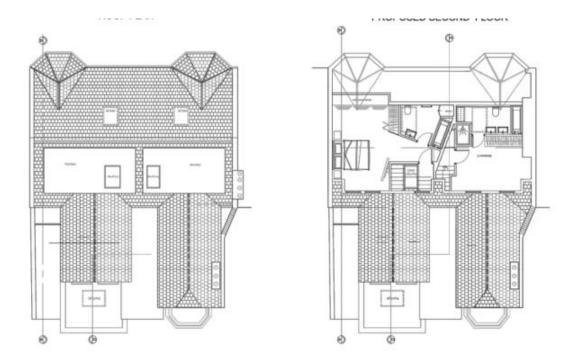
Approved roof plan and second floor plan 2008/1472/P
